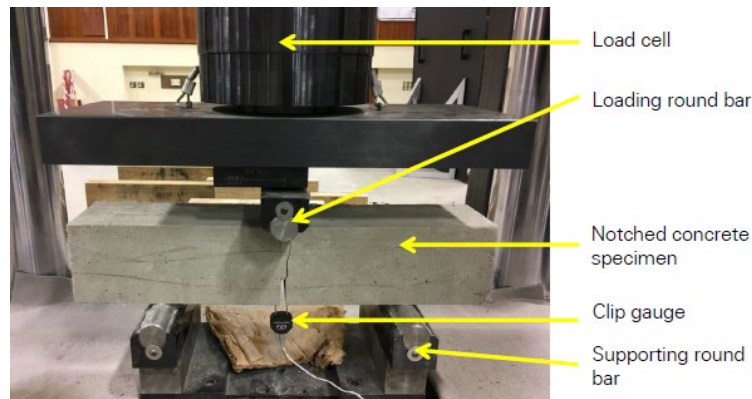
Beam specimen after testing in the loading rig (Grafe (2017))
